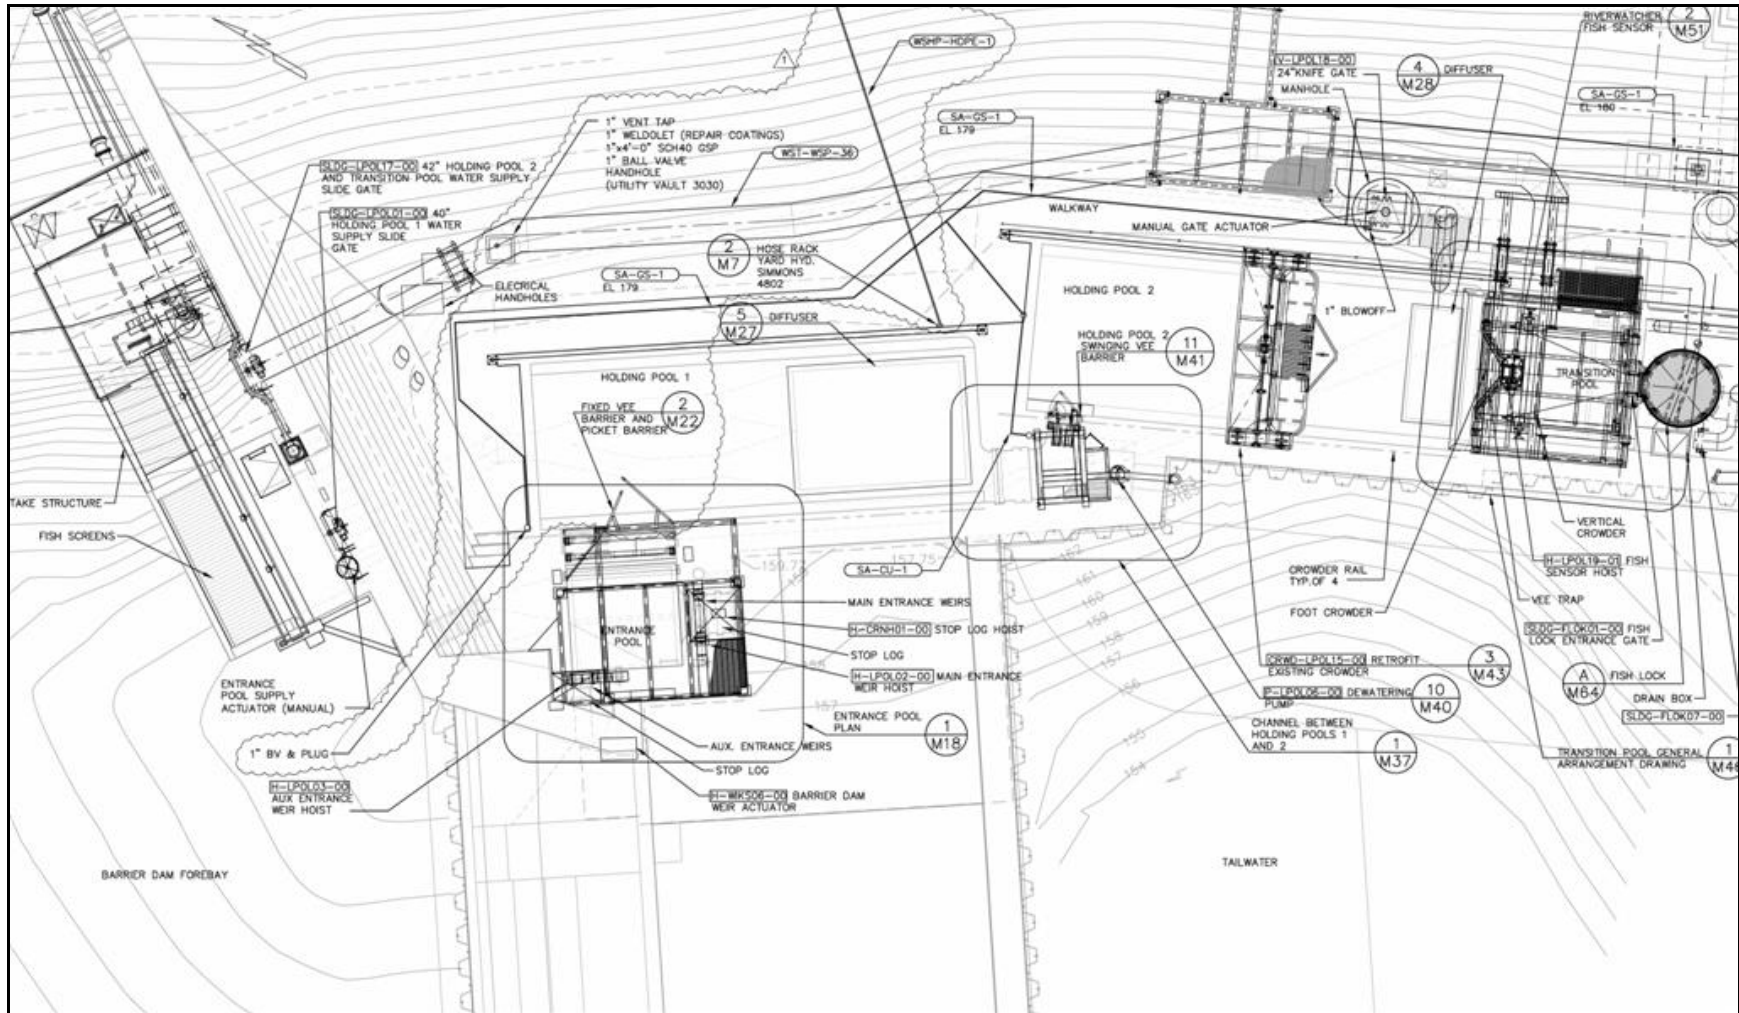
Site plan of Baker River AFT, Concrete, Washington.
